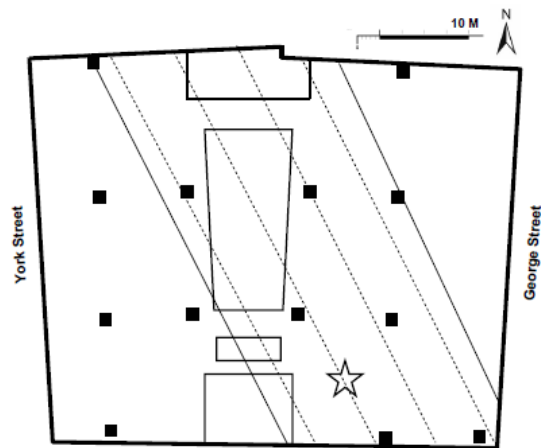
Top view indicating the location (☆) of the compliance noise and vibration measurements on the lowest retail floor and lowest office floor.
